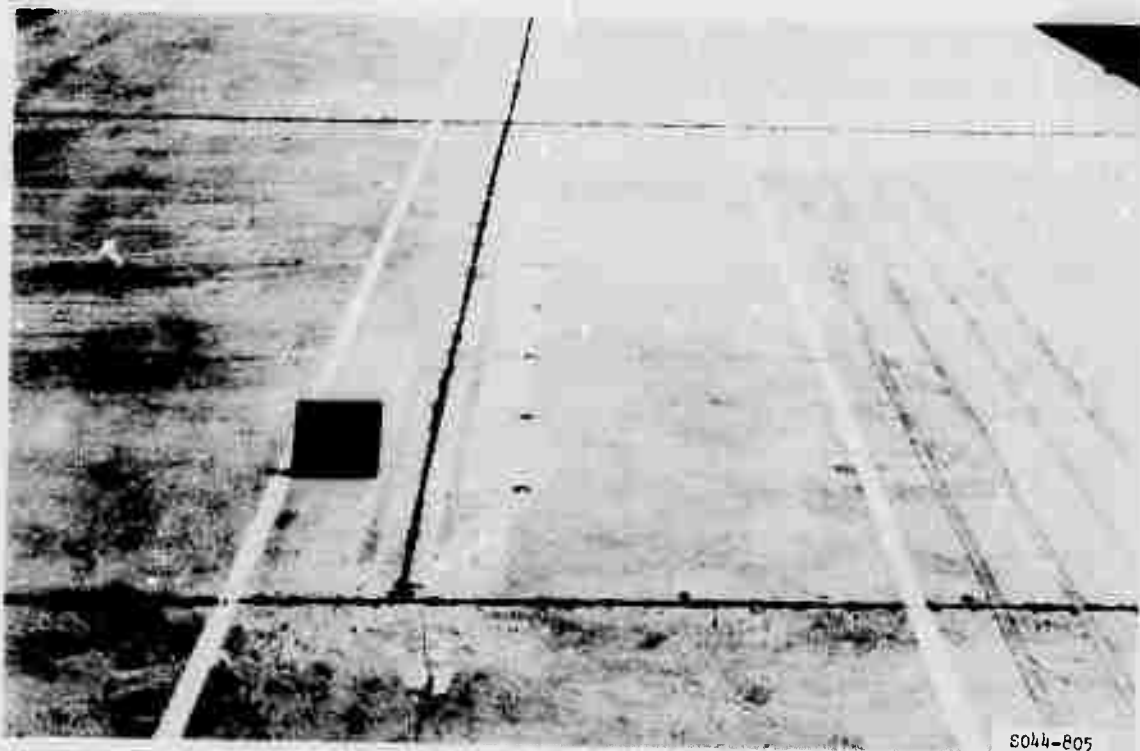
Item 3, lane 1, rigid pavement test section, prior to traffic
